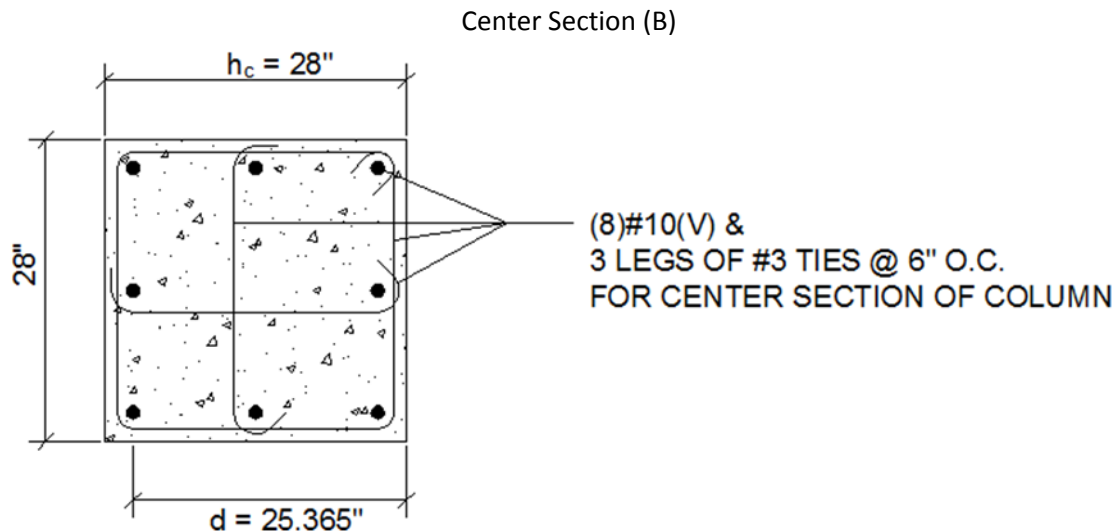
Exterior column, cross-section at center of column at ground floor level based on SDC D design.
